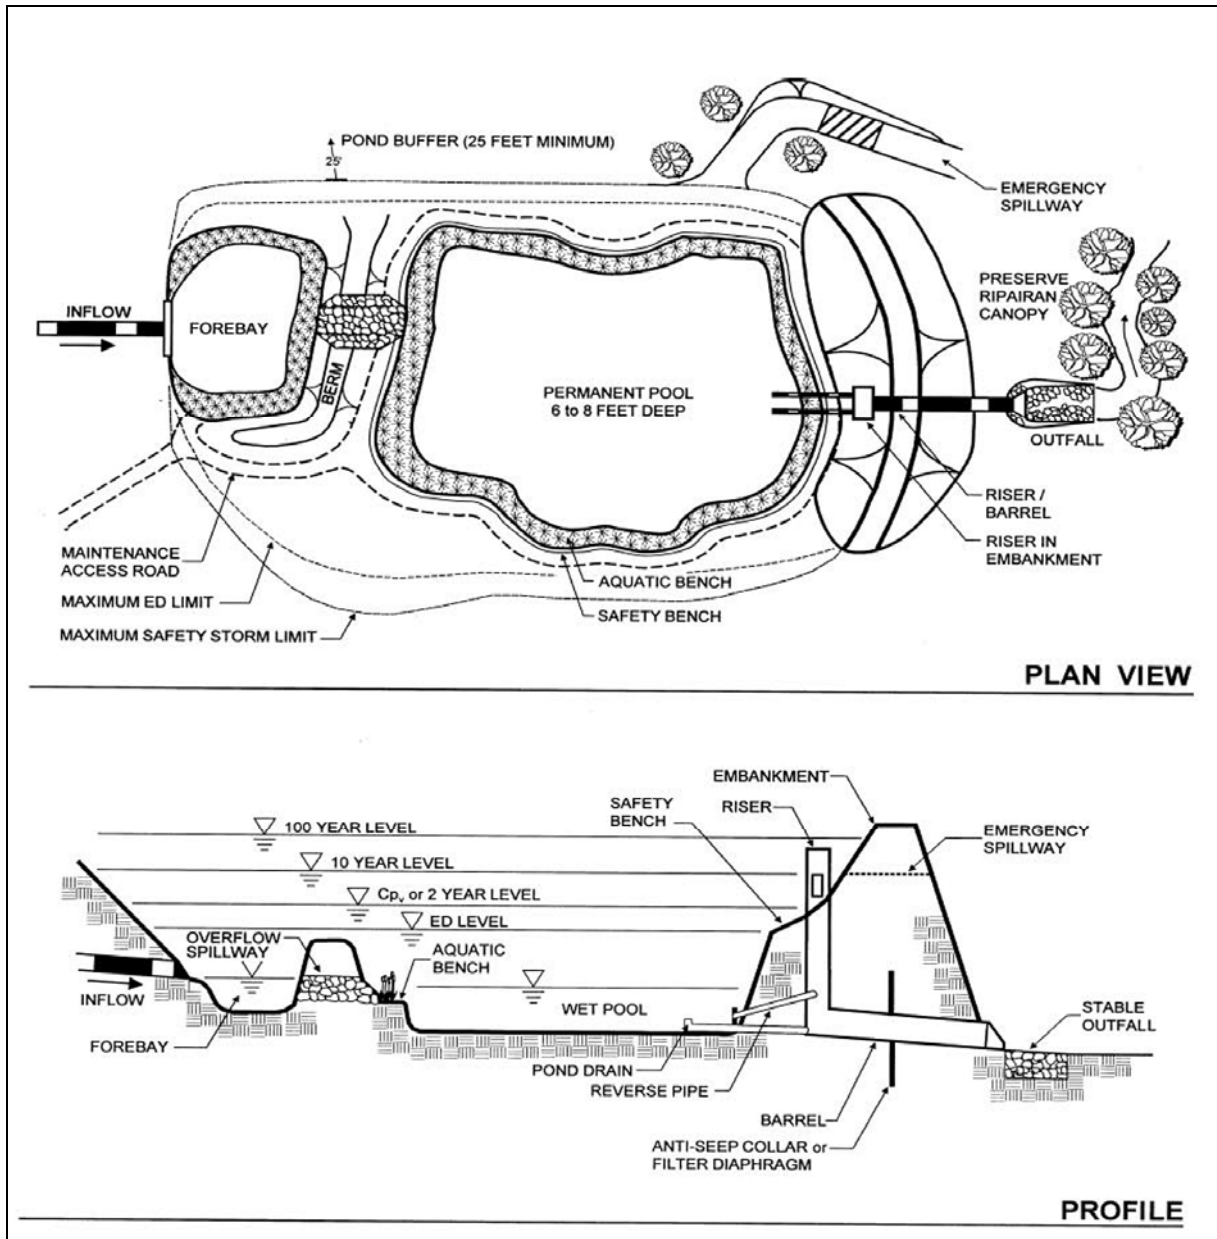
Wet Extended Detention Pond (Source Maryland Stormwater Design Manual)
